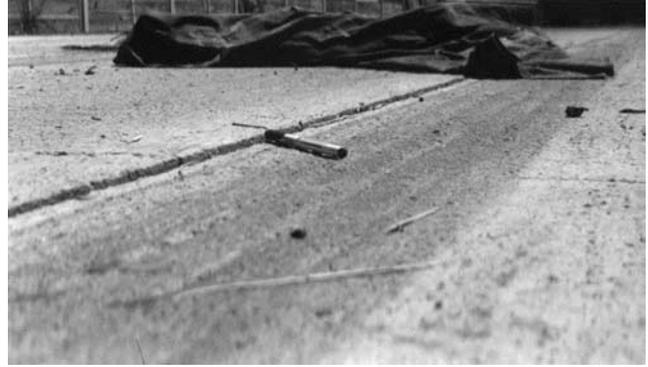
Typical UTW longitudinal faulting at the FHWA ALF.
